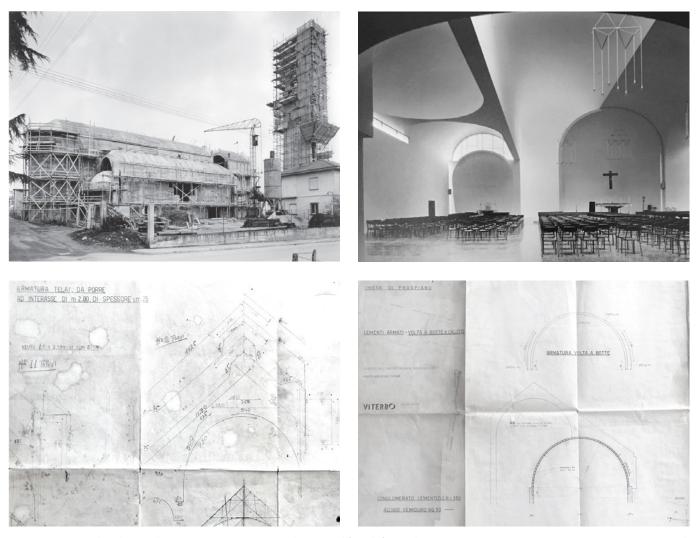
Prospiano Church in Gorla Minore, 1959-1965. From the top and from left to right: construction site view, interior view, cross-sections with reinforced concrete reinforcements details by the engineer Viterbo (courtesy of Gorla Minore Archive).
